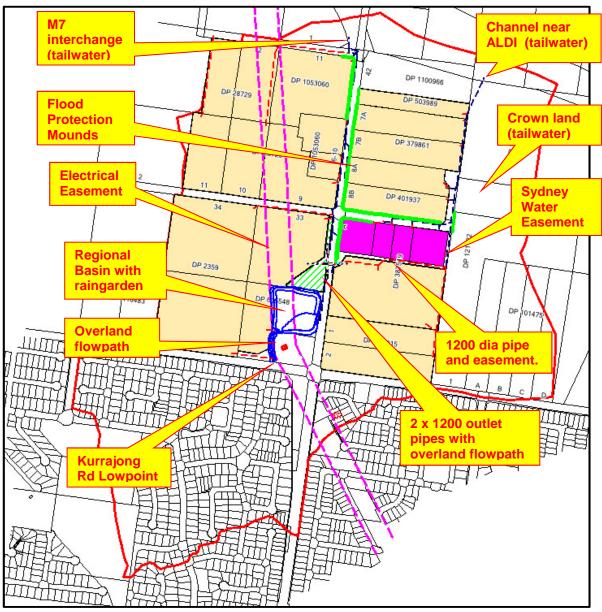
DEVELOPED SCENARIO SITE PLAN
